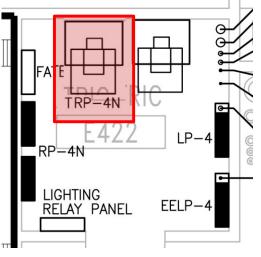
Second Floor Electrical Room Transformer Location
